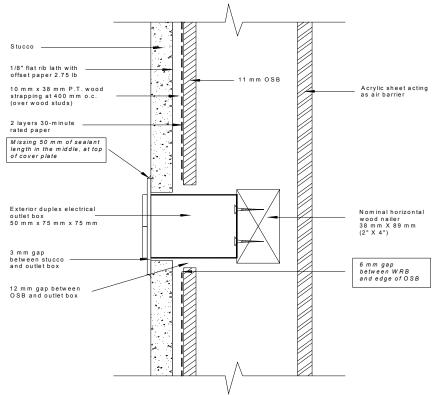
Wall/outlet box interface for specimen No. 5 - Vertical section
